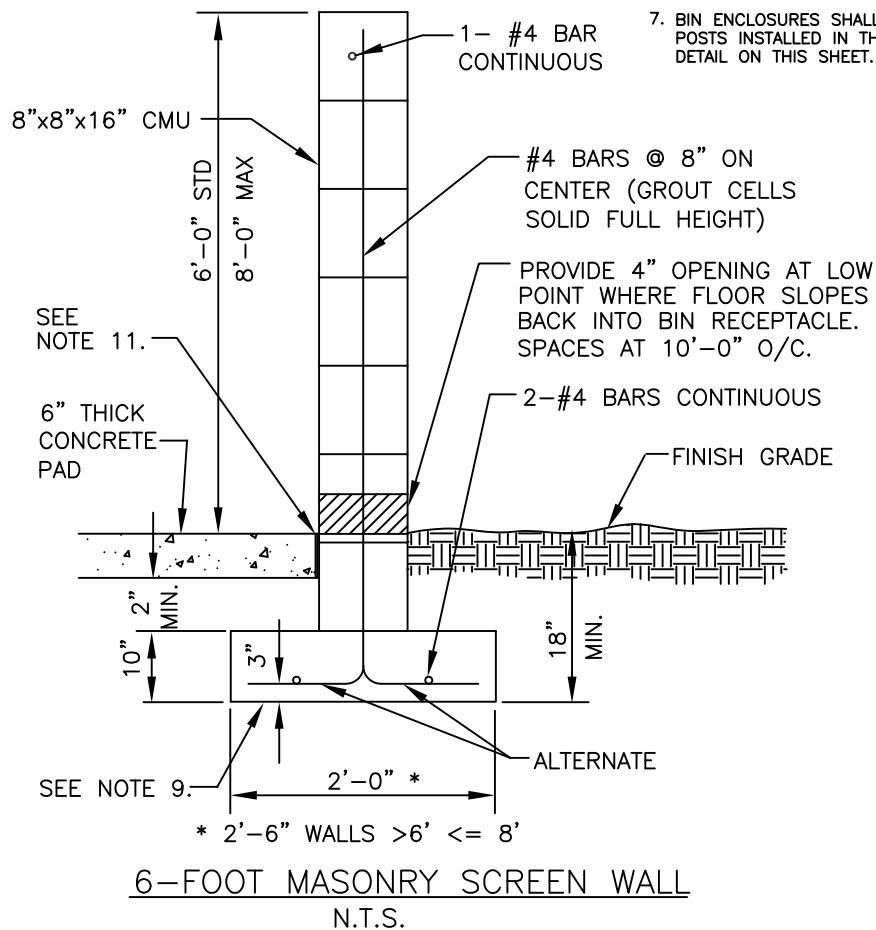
TOWN OF GILBERT STANDARD DETAIL	TRIPLE-WIDE BIN ENCLOSURES	REVISED 6/2005	DETAIL NO. 80-2
